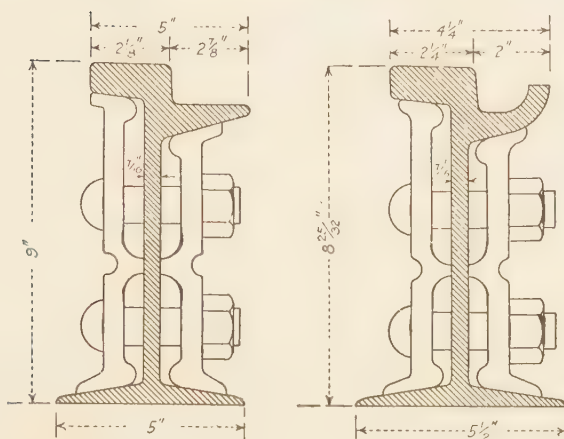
Tram section girder rail. FIG. 146.—Grooved section girder rail.
